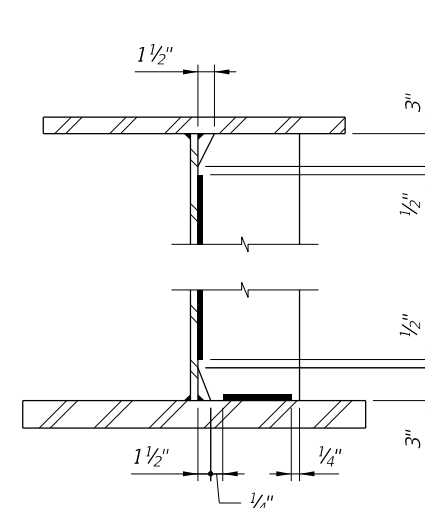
(PLATE REQUIRED ON ONE OR BOTH SIDES, SEE FRAMING PLAN)
